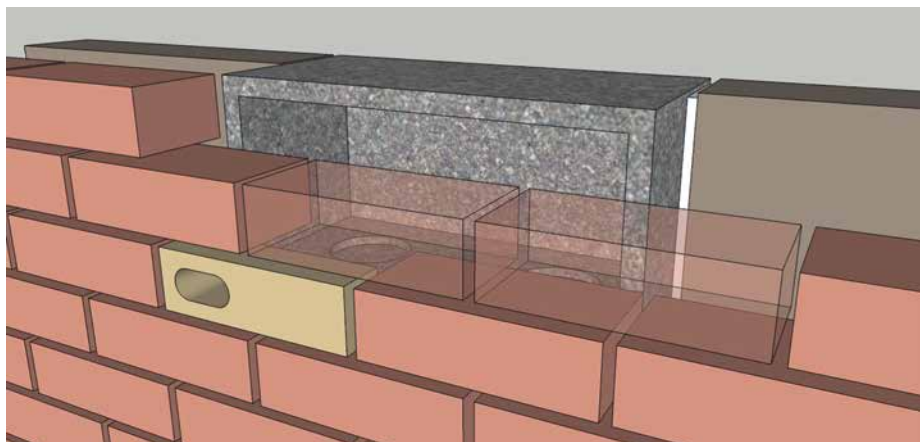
Cross section of Cambridge Brick system. Photo credit Dick Newell.
